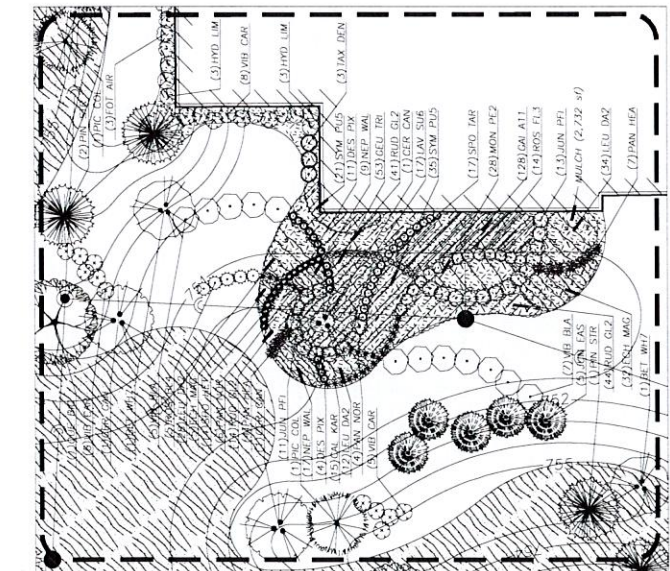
DETAILED LANDSCAPE PLAN - (INFUSION GARDEN AREA)
